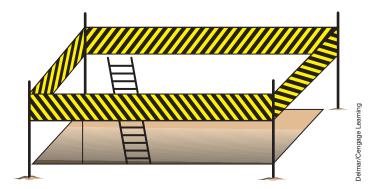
Place a barricade around a trench and use a ladder to enter and exit the trench.
